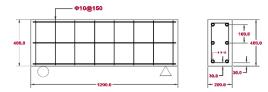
Reinforcing details and dimensions patterns of all Deep beam Specimen
